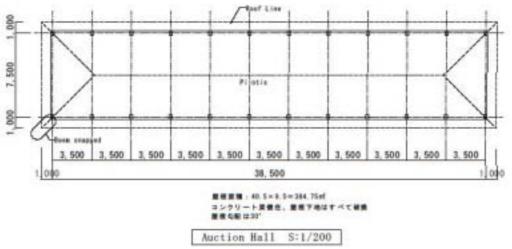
Plan of the Auction Hall Roof in Kirinda Fishery Harbor
